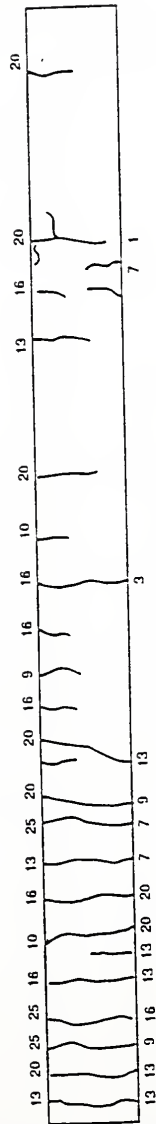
Crack Patterns, Bridge 40-49-7032
